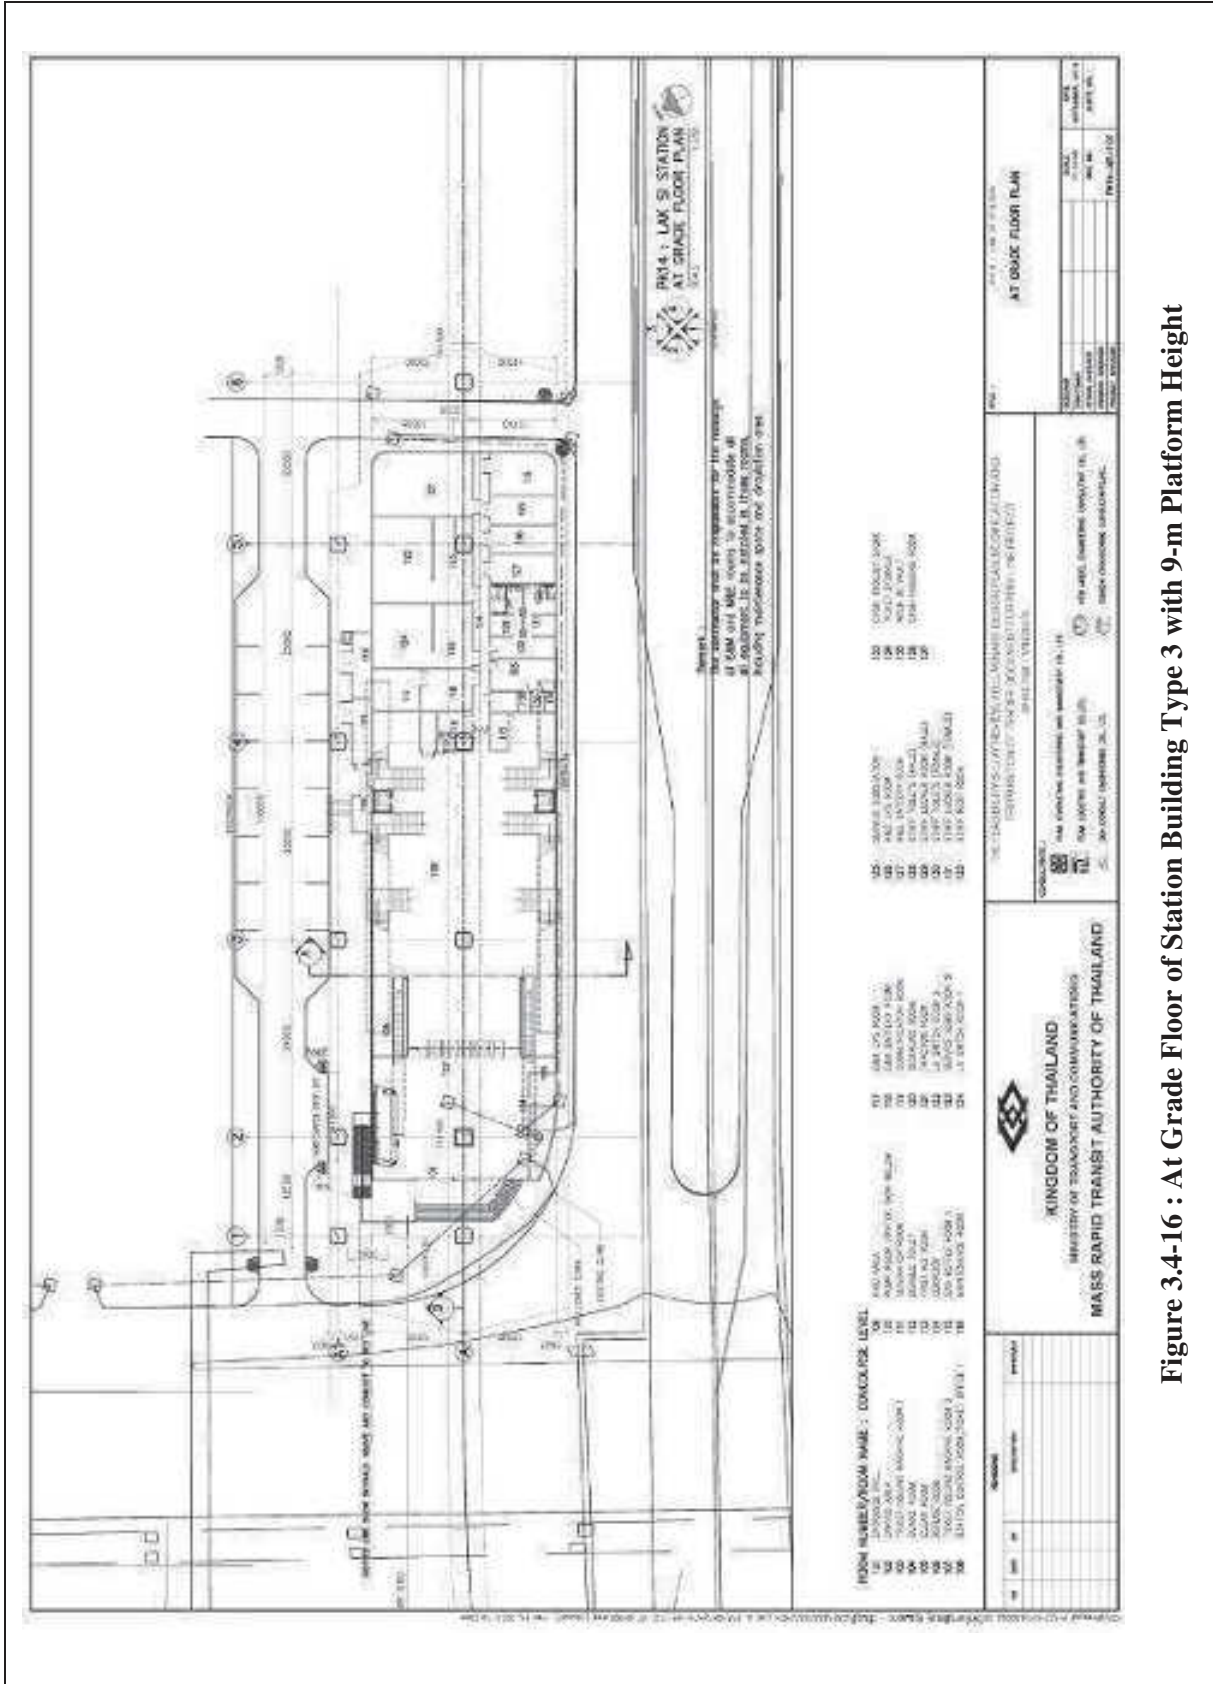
At Grade Floor of Station Building Type 3 with 9-m Platform Height
